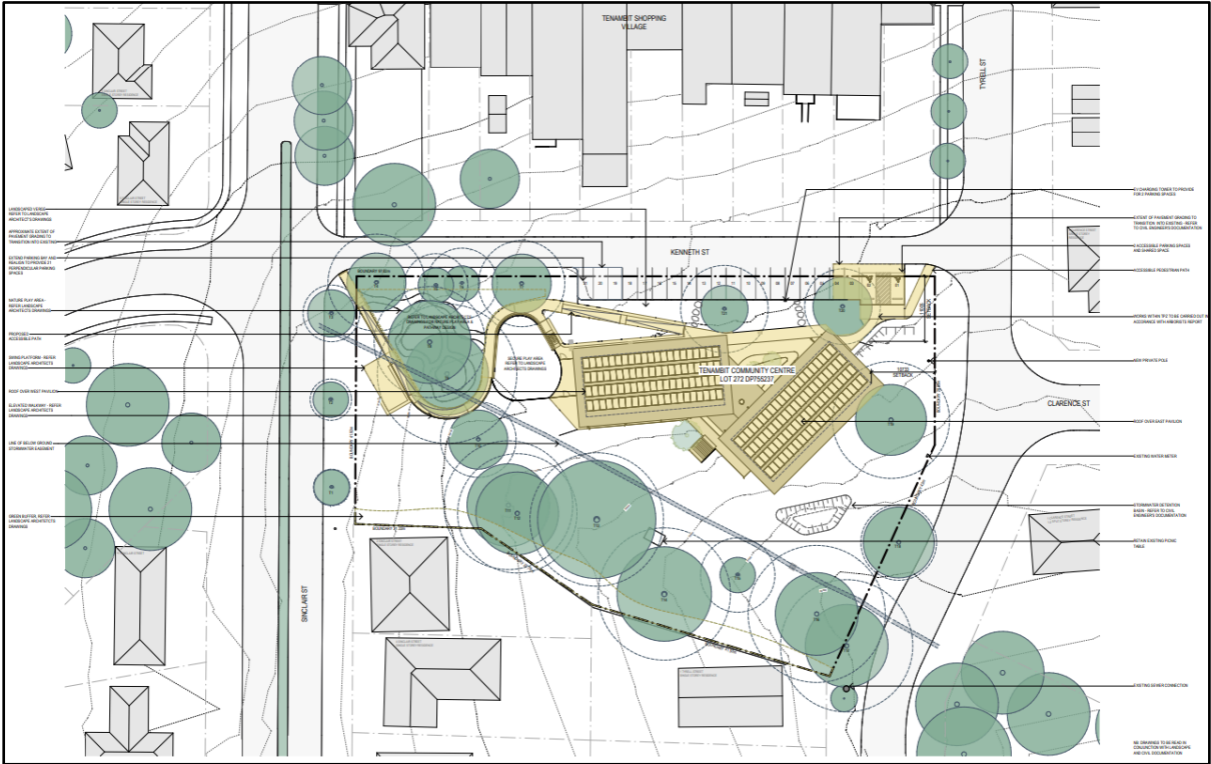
Proposed Site Plan. Source: Source: AJC Architects dated 23 April 2024.
